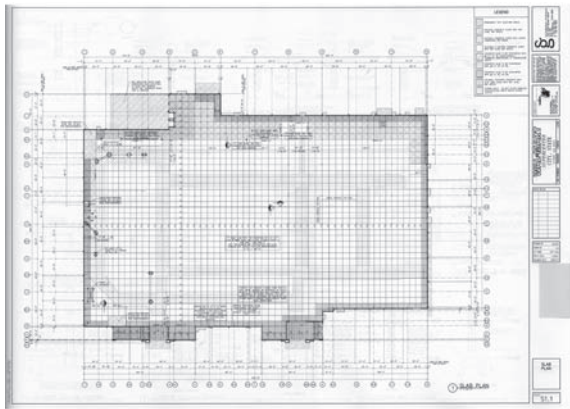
The floor slab is another primary site of connection for Prototype 143.
